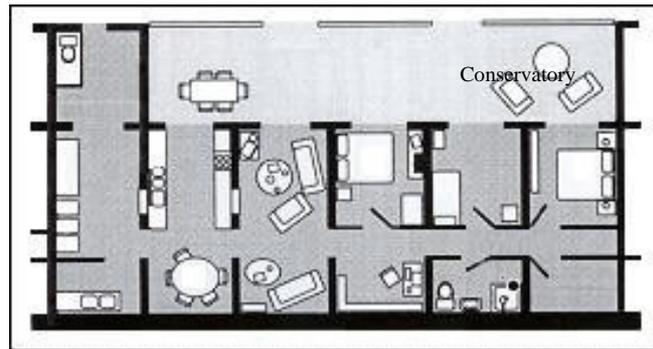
Internal layout of six bay dwelling. Note the use of an extended porch wall (top right) to form the conservatory sidewalls.
